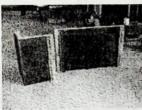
Sketches of timber moulds for "T" and "L" shaped wall junction
